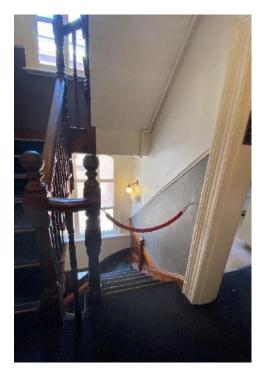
The original stair (1.02) has now been reinstated for use at first floor level and access to the hotel reception area is via the new stair and lift at the rear of the building. Source: TKD Architects 2020.
